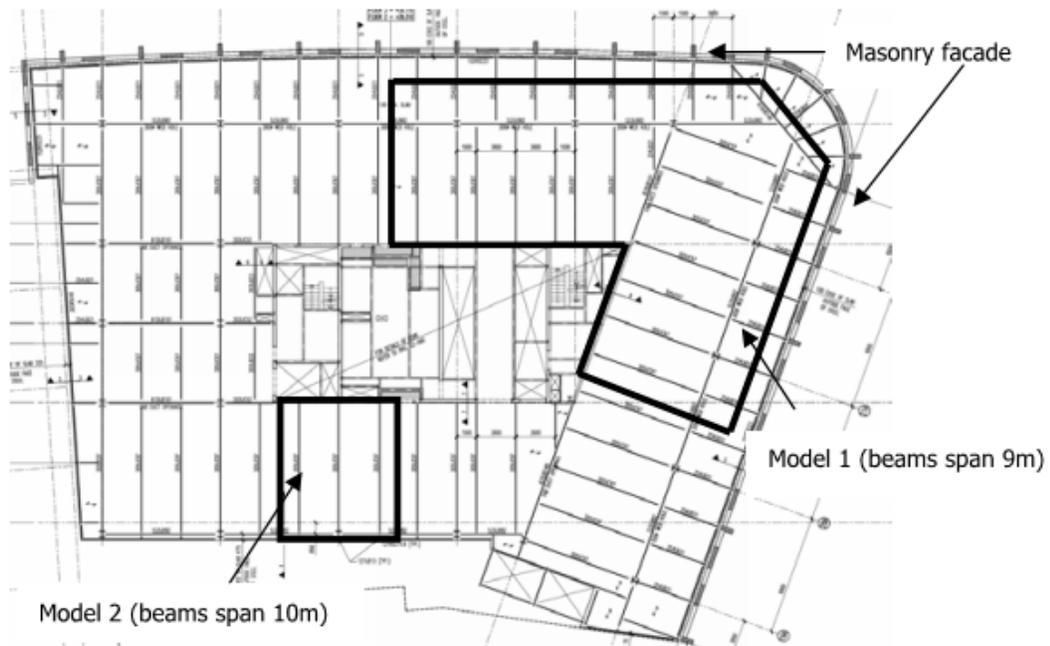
Floor plan of Mincing Lane; reproduced from Lamont et al. (2006)
